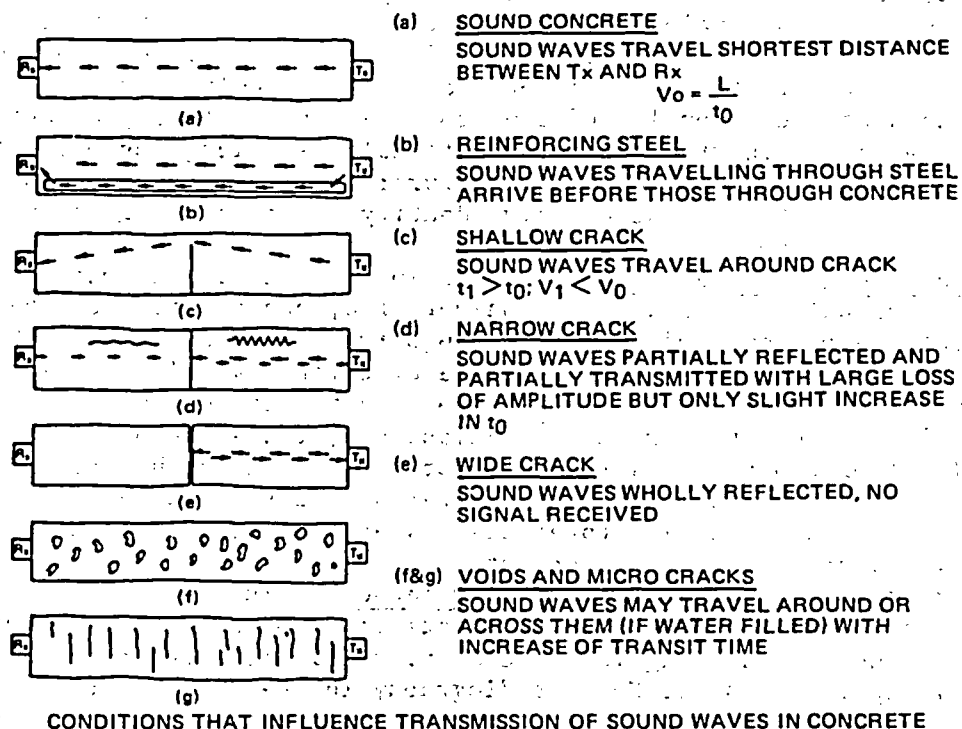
Conditions that influence transmission of sound in concrete. Source: V. R. Stirrup et al., "Pulse Velocity as a Measure of Concrete Compressive Strength," *In Situ/Nondestructive Testing of Concrete*, SP-82, Paper 11, American Concrete Institute, Detroit, 1984.
